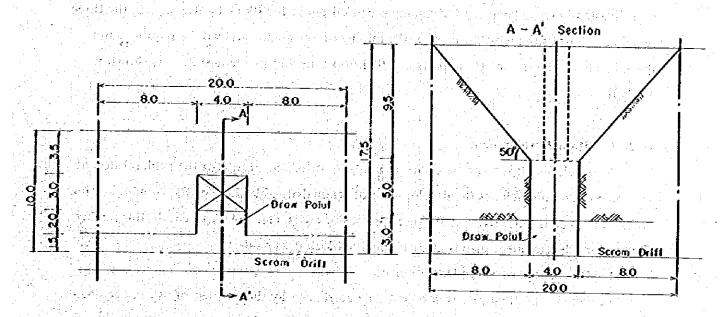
Plan and Section of Draw Cone (unit: m)
